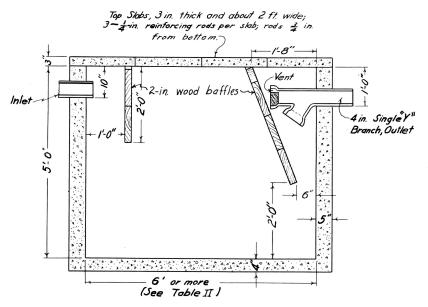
A concrete septic tank is easily constructed with home labor.
